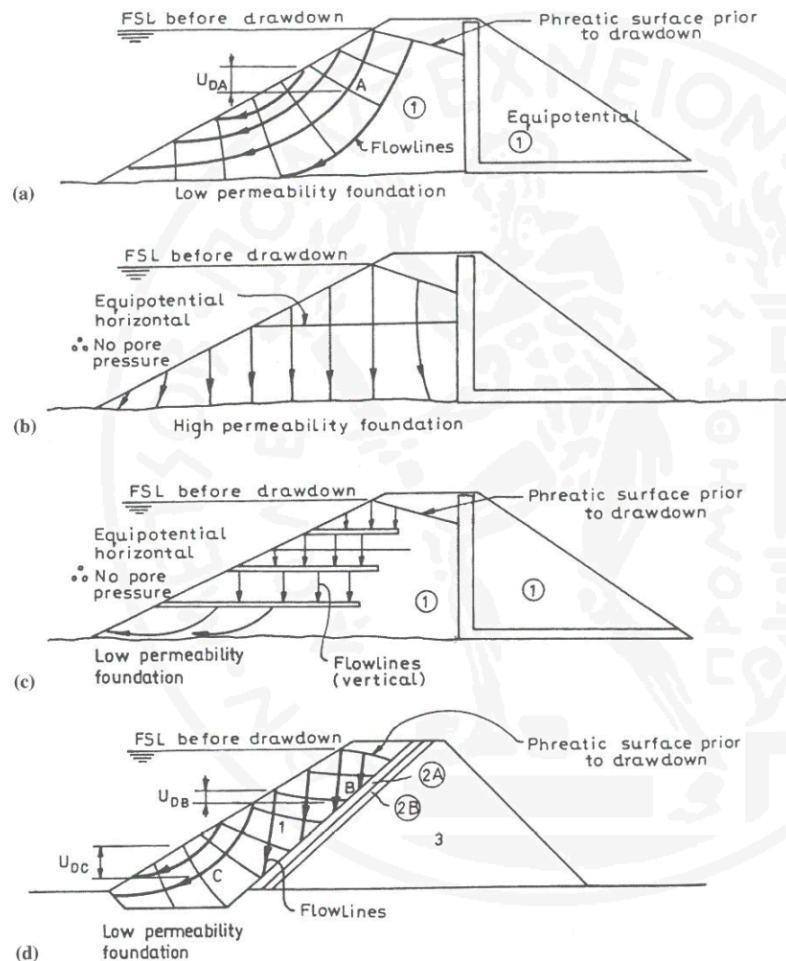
Drawdown flownets (a) earthfill with chimney drain, low permeability foundation; (b) earthfill with chimney drain, high permeability foundation; (c) earthfill with horizontal drainage blankets; (d) sloping upstream core, low permeability foundation. Note that flownets assume isotropic permeability and $k_H = k_V$ and the reservoir is completely drawn down.
